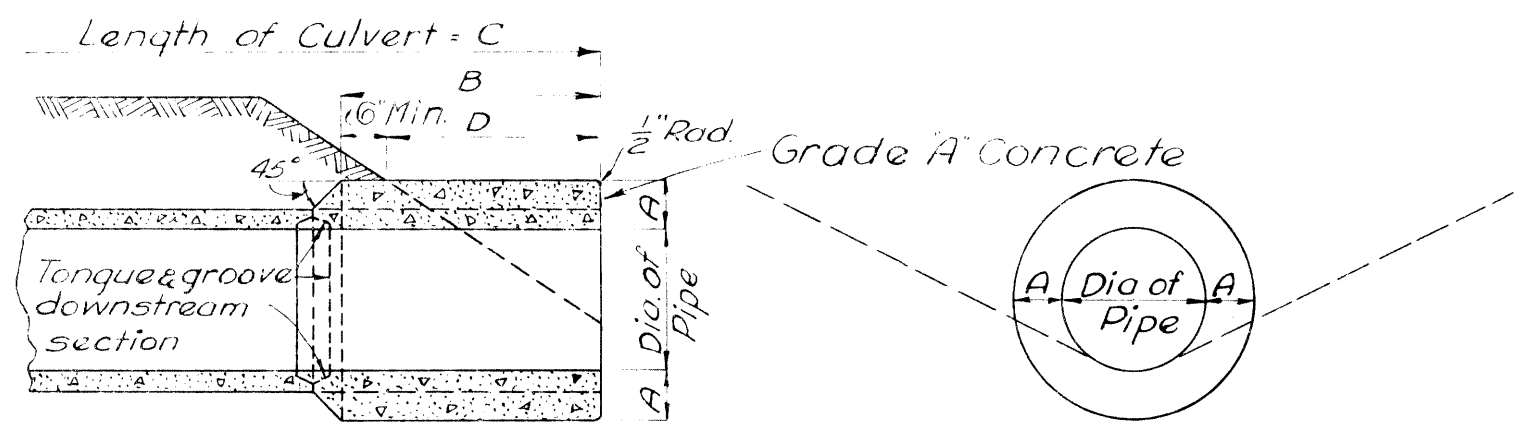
DETAIL OF RING TO BE USED ON VITRIFIED TILE
